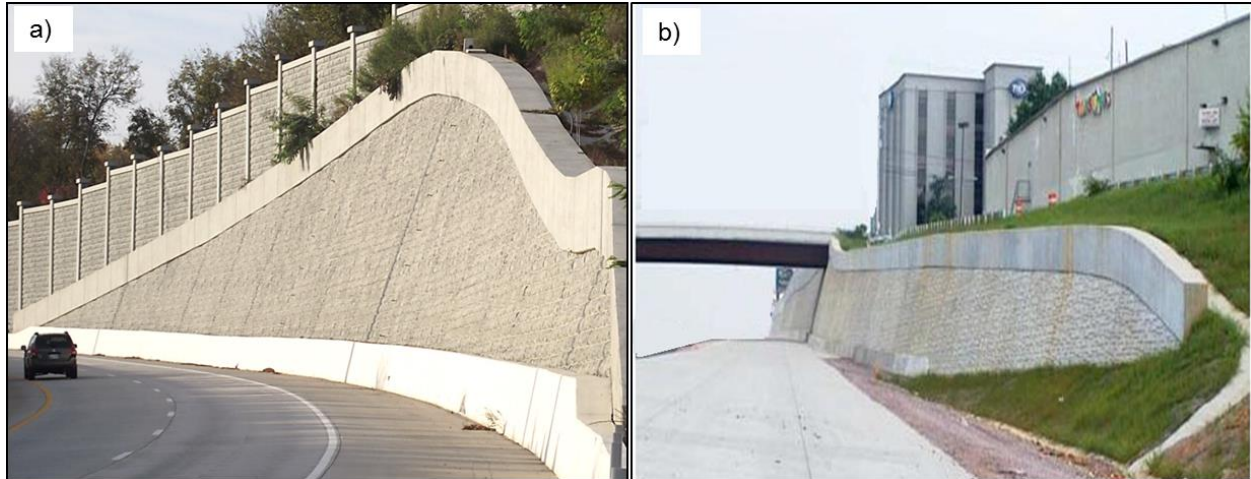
The PFRWs built along the I-40/I-75 corridor (Knoxville, TN). a) The SmartFix wall and b) The West Hills wall.
